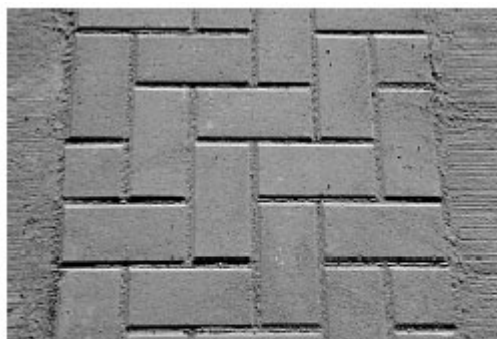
A close-up of the concrete paver surface at the PTI test track.
